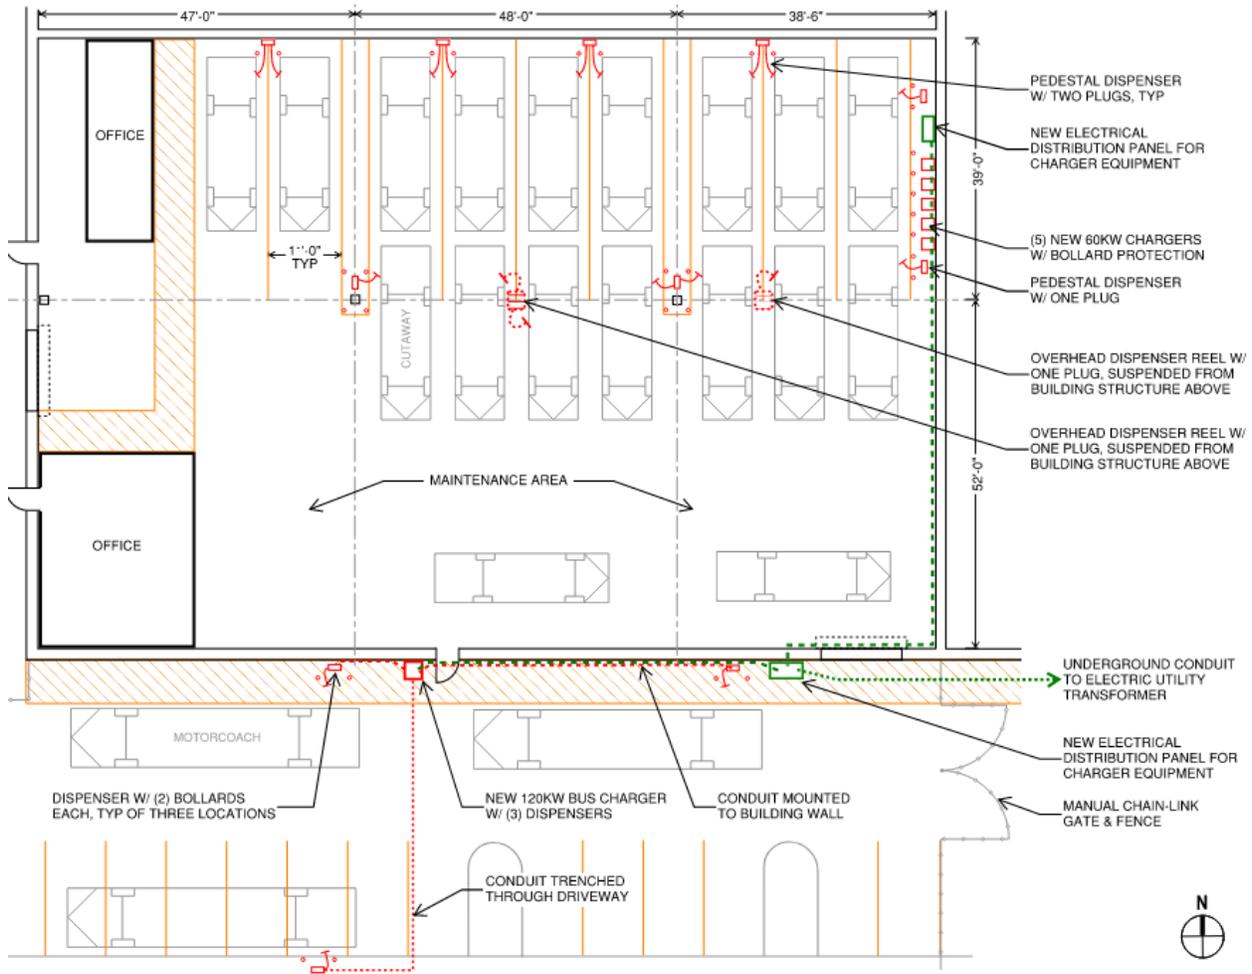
Site Plan Concept for SCT Link, 140 Enterprise Court, Suite B, Galt
